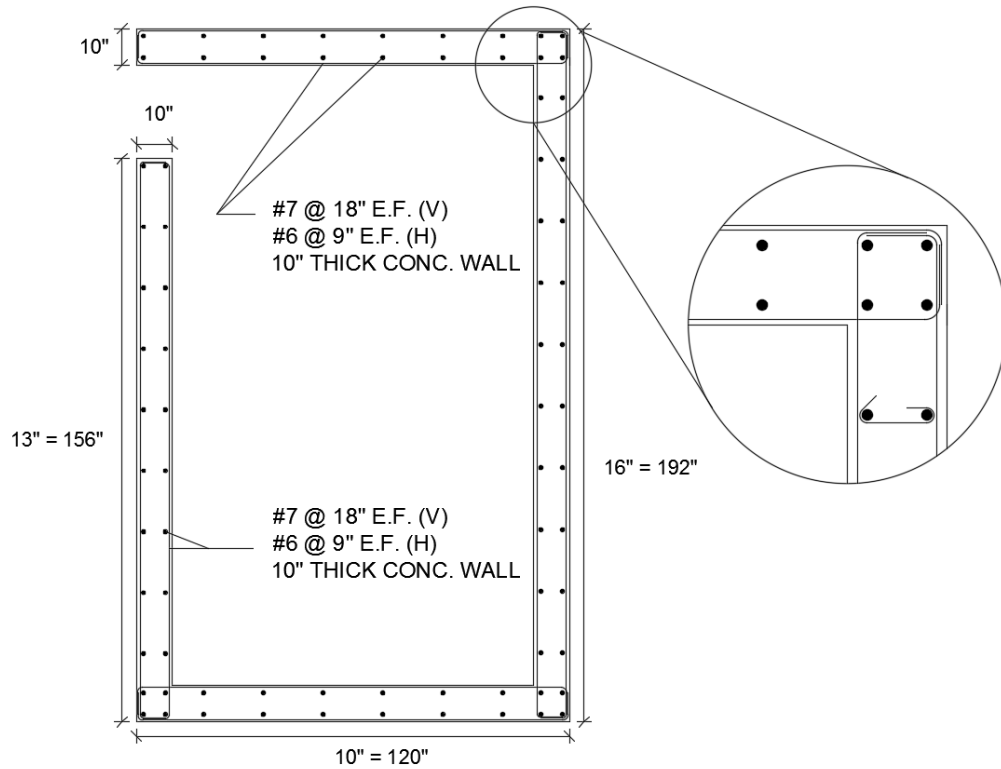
Original stairwell shear wall cross-section at the 2nd floor level
